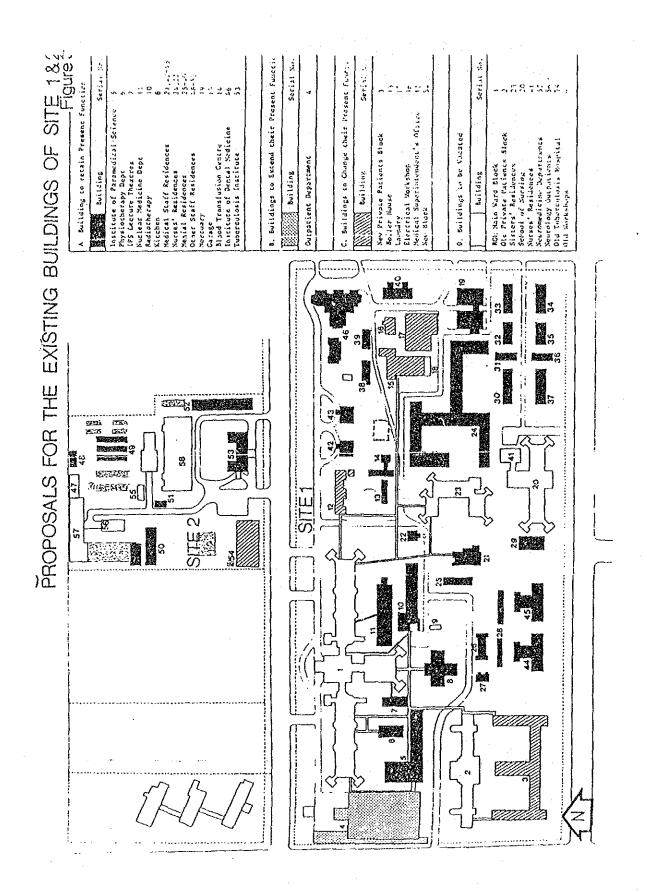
THE EXISTING BUILDING OF SITE
